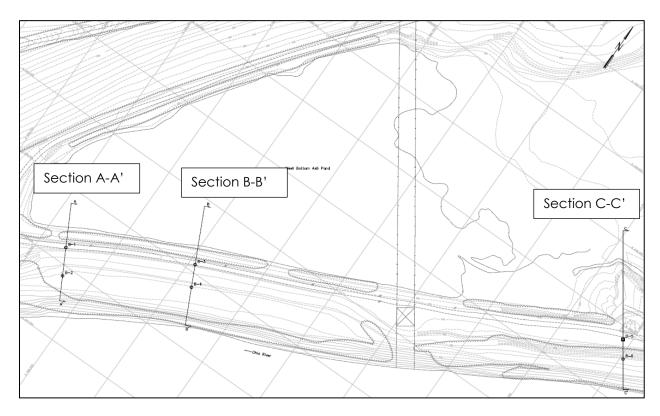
Clifty Creek Power Plant West Boiler Slag Pond – Plan View of Cross Sections
